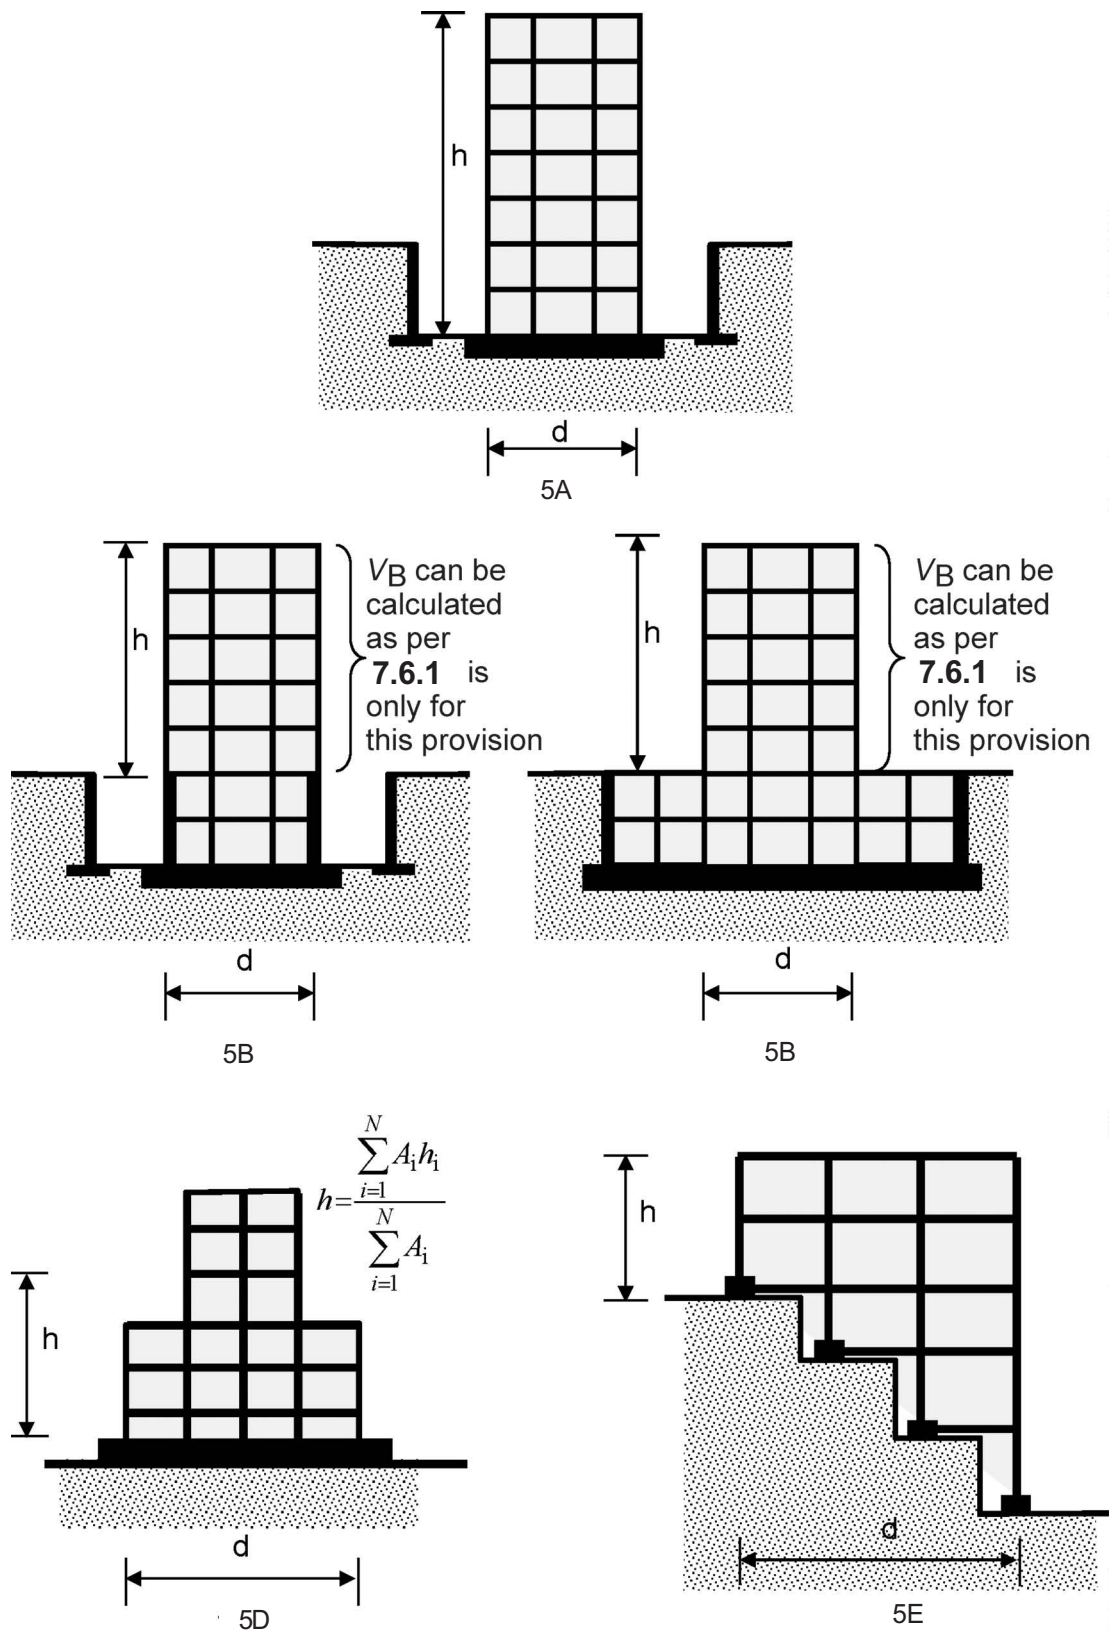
DEFINITIONS OF HEIGHT AND BASE WIDTH OF BUILDINGS
